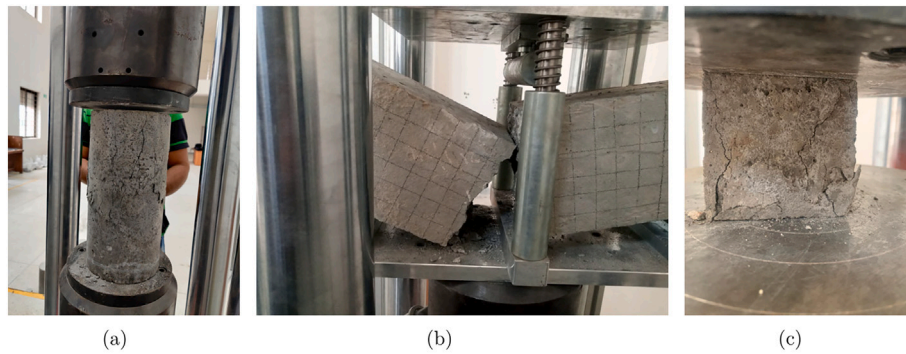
Typical failure modes observed during mechanical testing: (a) compressive failure of a concrete cylinder under axial loading; (b) flexural failure of a beam during three-point bending; (c) compressive crushing of a cube specimen.
